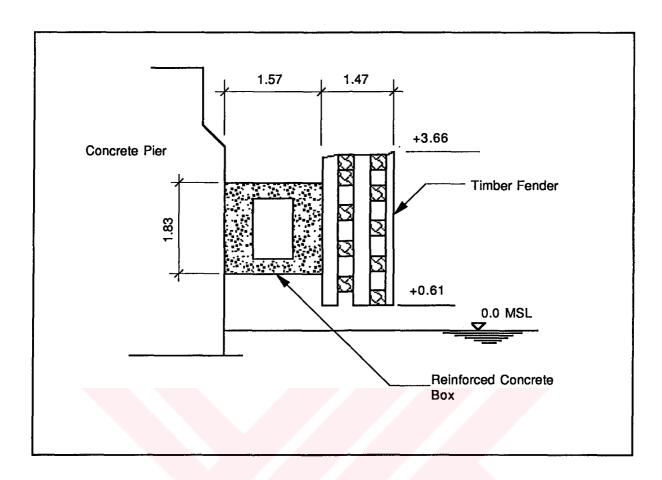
CRUSHABLE CONCRETE BOX FENDER ON THE FRANCIS SCOTT KEY BRIDGE, BALTIMORE, USA (In meters)
